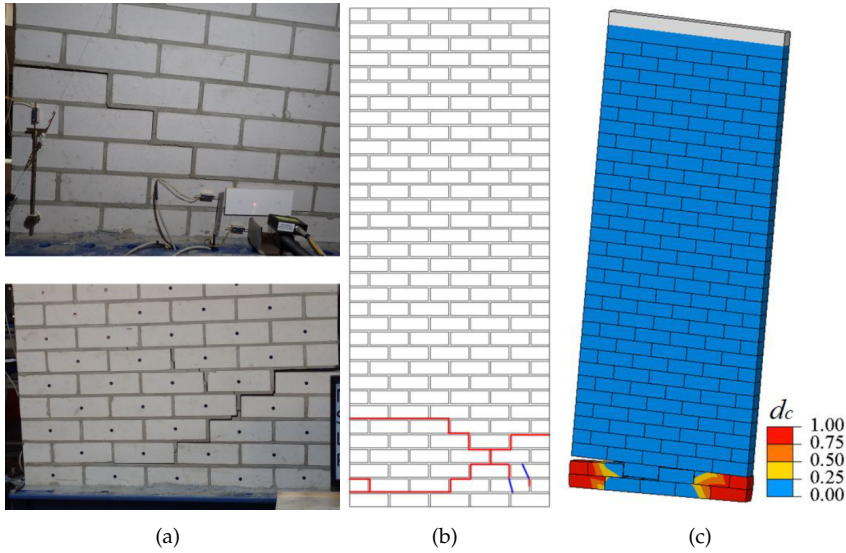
Slender wall (COMP-2) crack pattern: (a) photos of the cracked wall, (b) experimental crack pattern and (c) numerical compressive damage contour plot.
